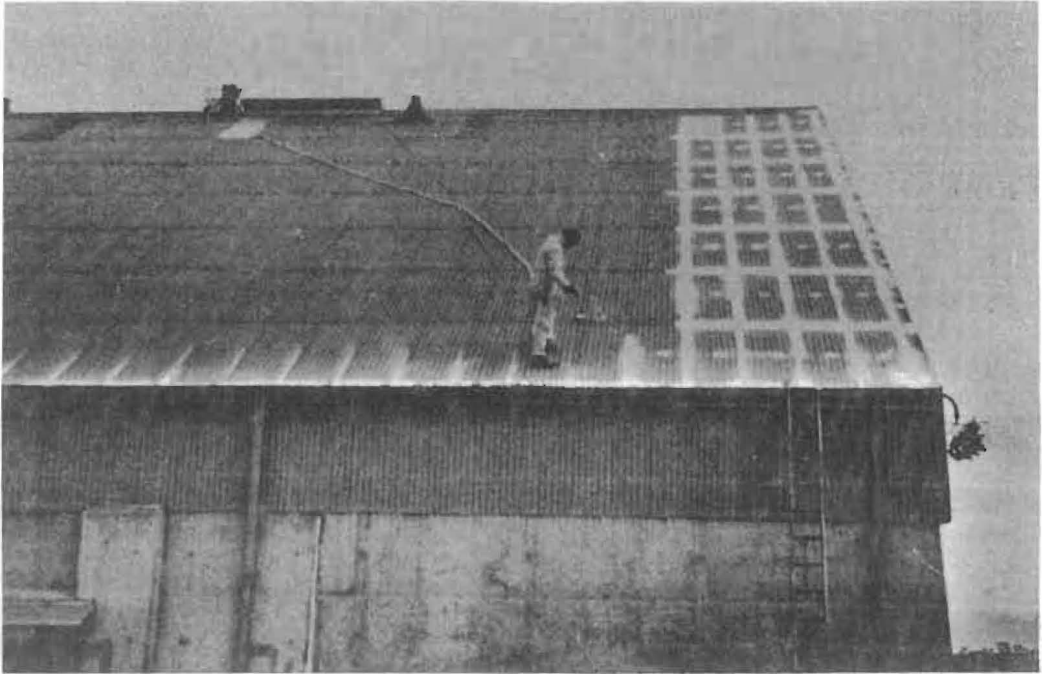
Spray sealing of all lap ends of corrugated iron roof sheets on horizontal silo at Meckering.
